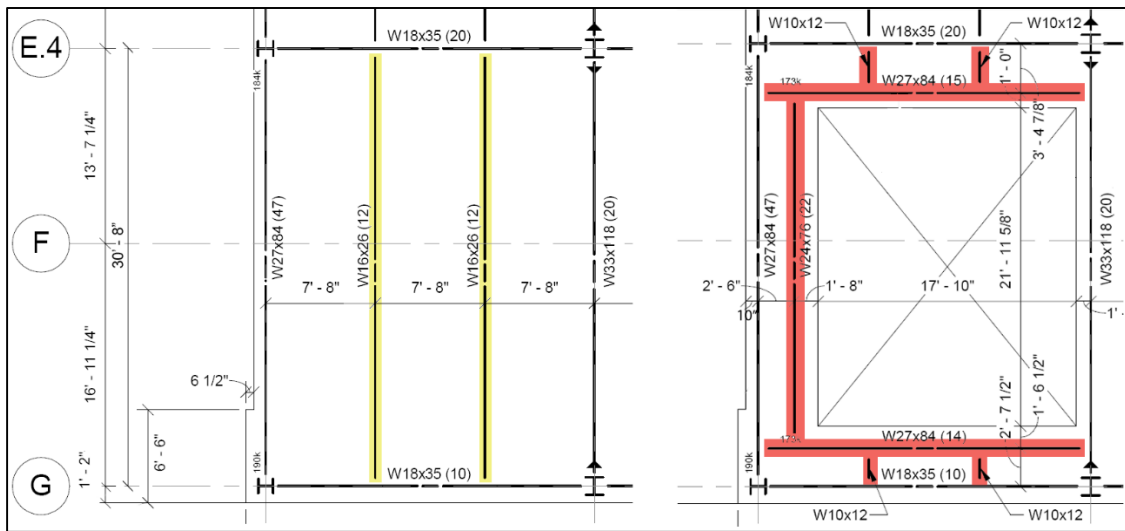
(Left): Proposed redesign of structural slab with new members highlighted in yellow.
